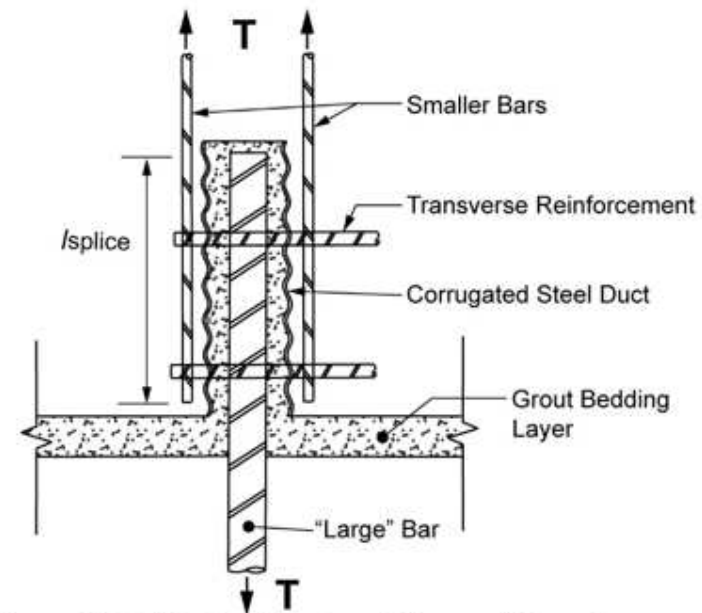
Splicing of Grouted Duct Bars to Other Bars
